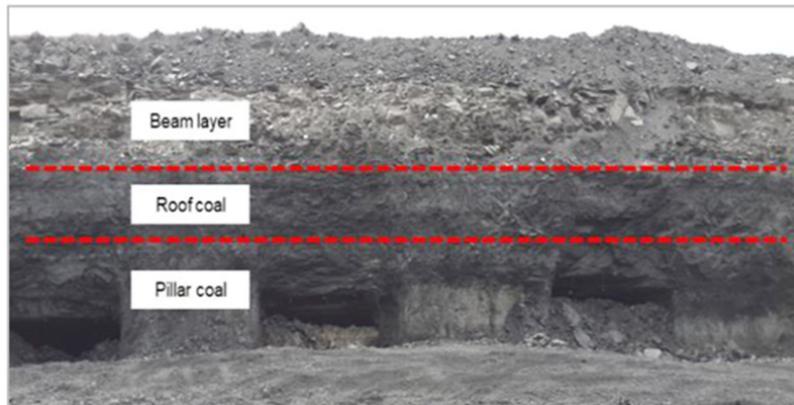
Typical layout of the beam above old workings and the edge of the highwall supported by pillars
